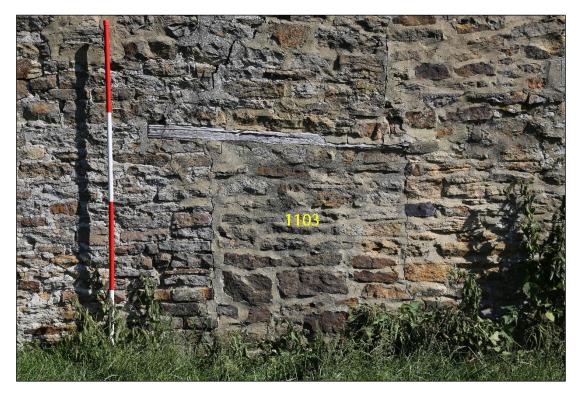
blocked opening 1103 at ground-floor level within elevation 1100.
